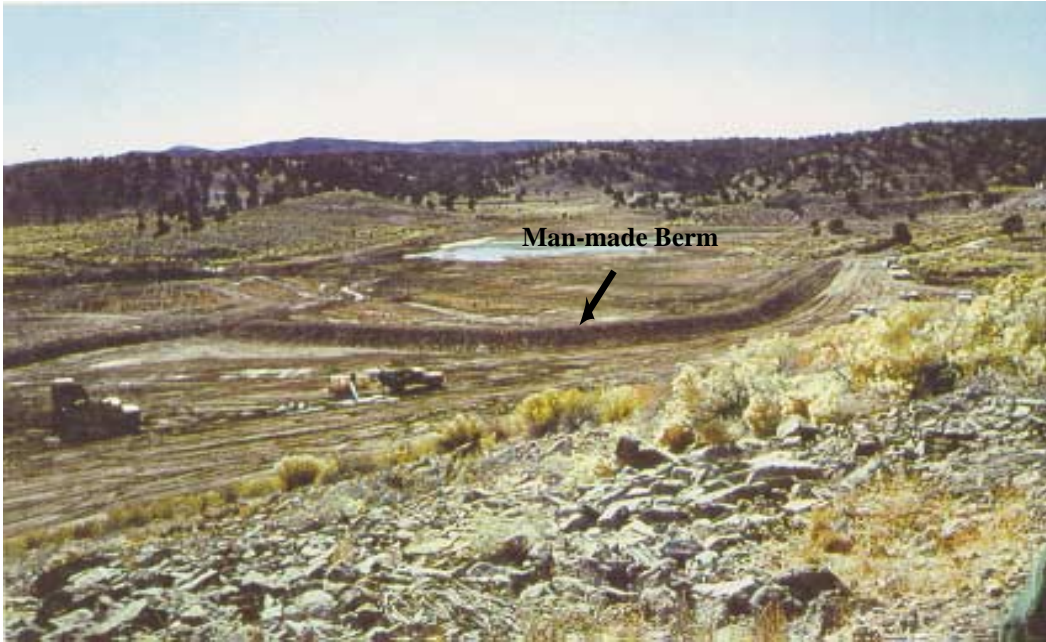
Mathews Canyon Reservoir from top of dam.
